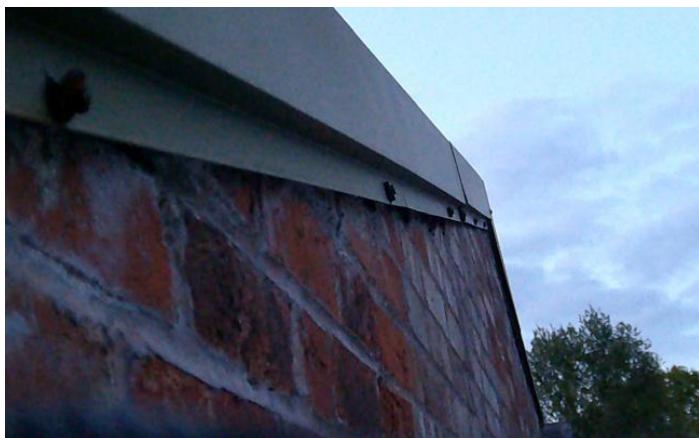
Facing northwest toward the upper east gable showing a gap between metal cladding and brickwork potentially providing access under the roof covering to bats. No signs of bats found during the inspection.
